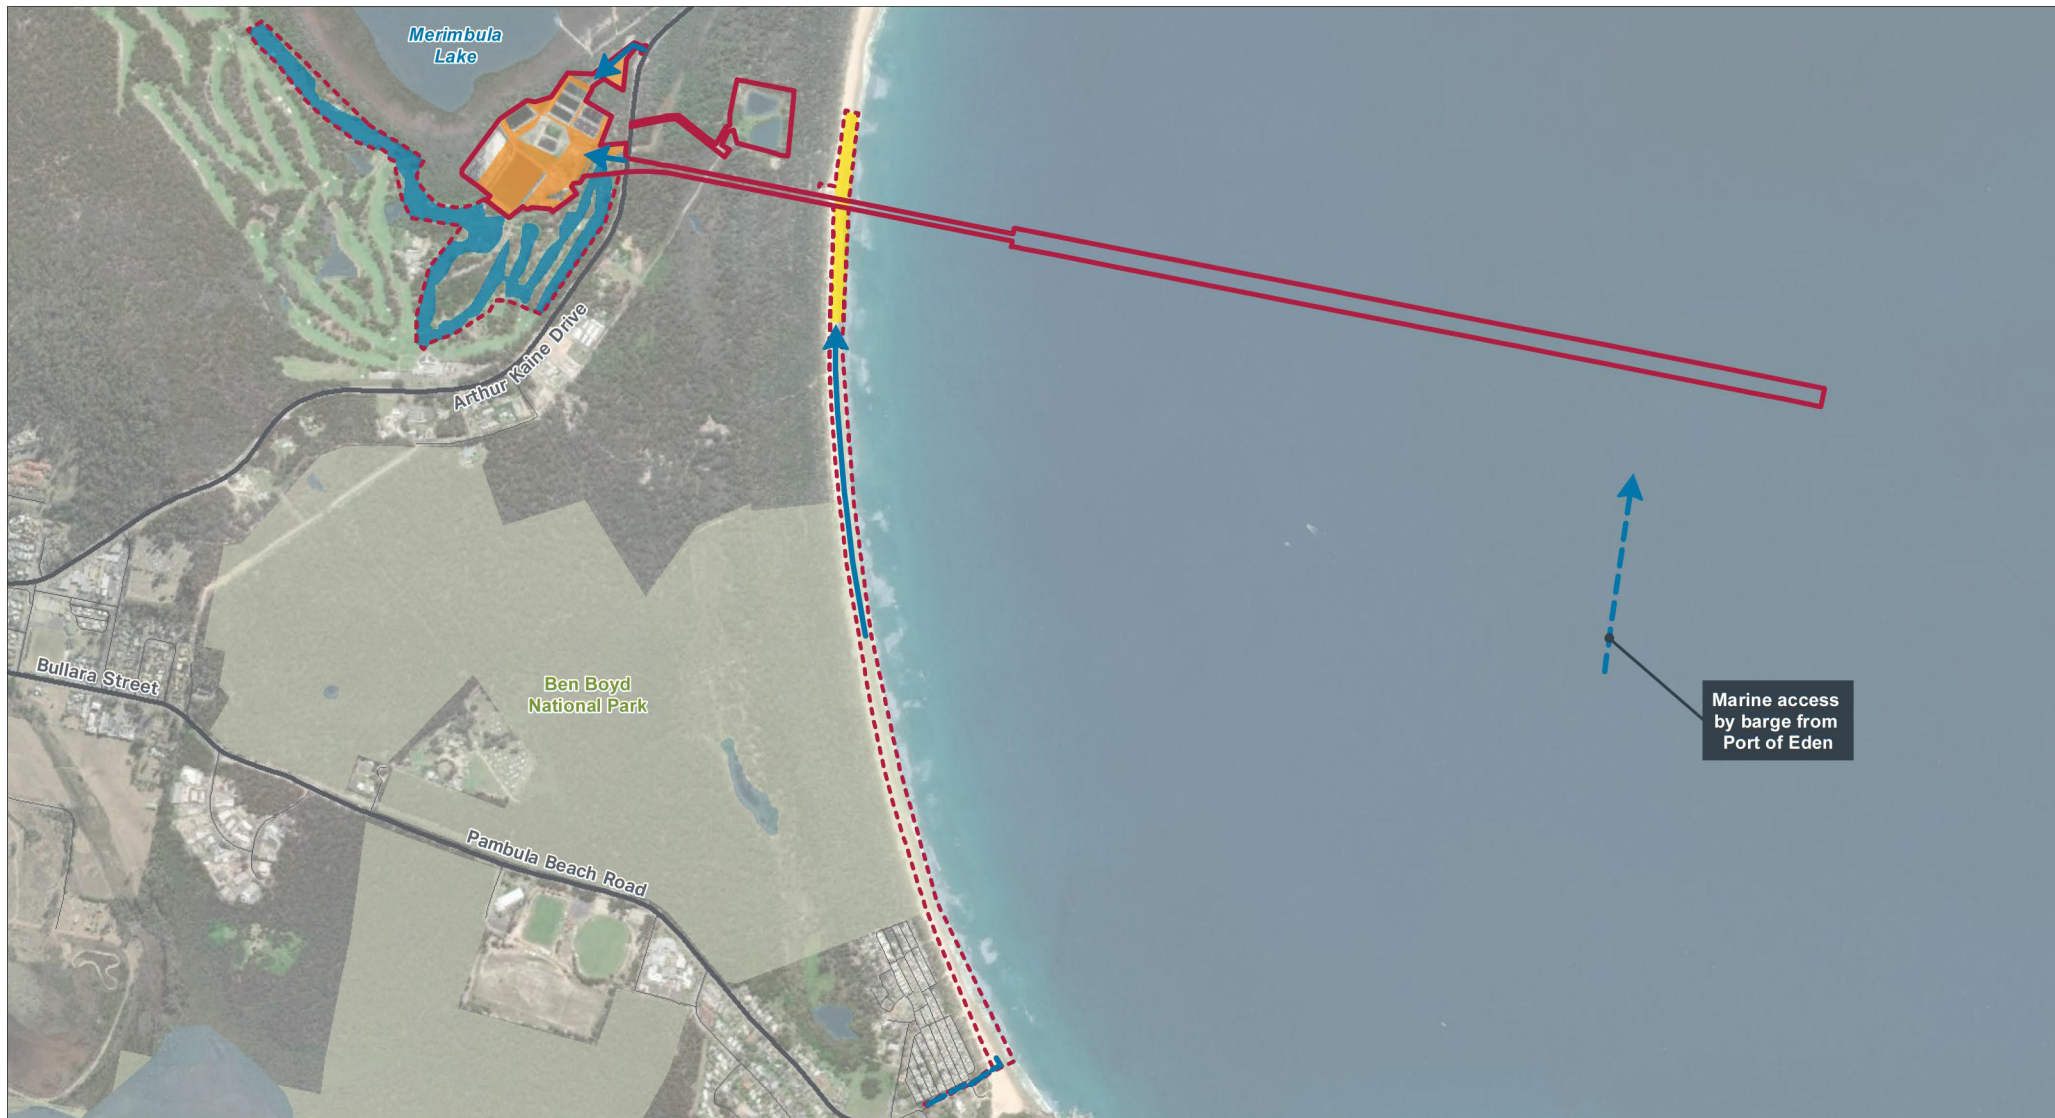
CONSTRUCTION COMPOUND/LAYDOWN AREAS
